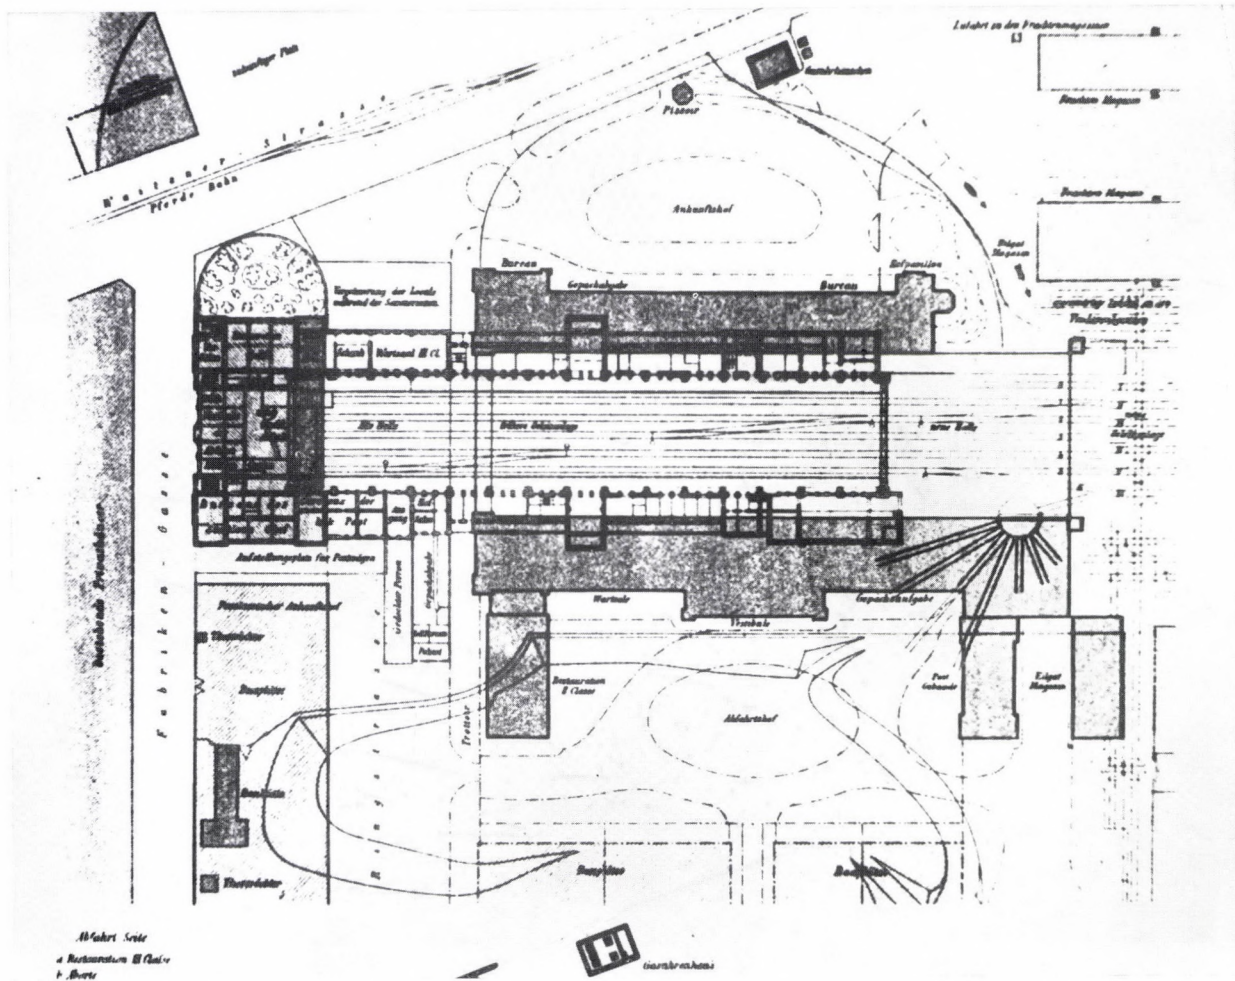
Plans of the "Pest Terminal" built in 1846, and of the new "Western Station" in a superimposed form (contemporary drawing)
